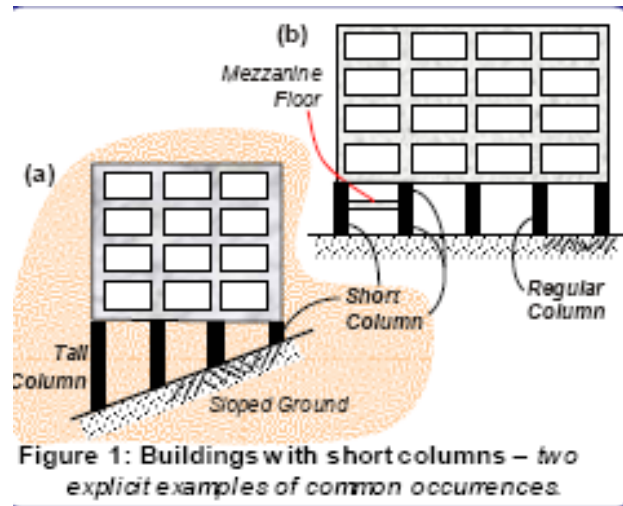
Buildings with short columns – two explicit examples of common occurrences.
